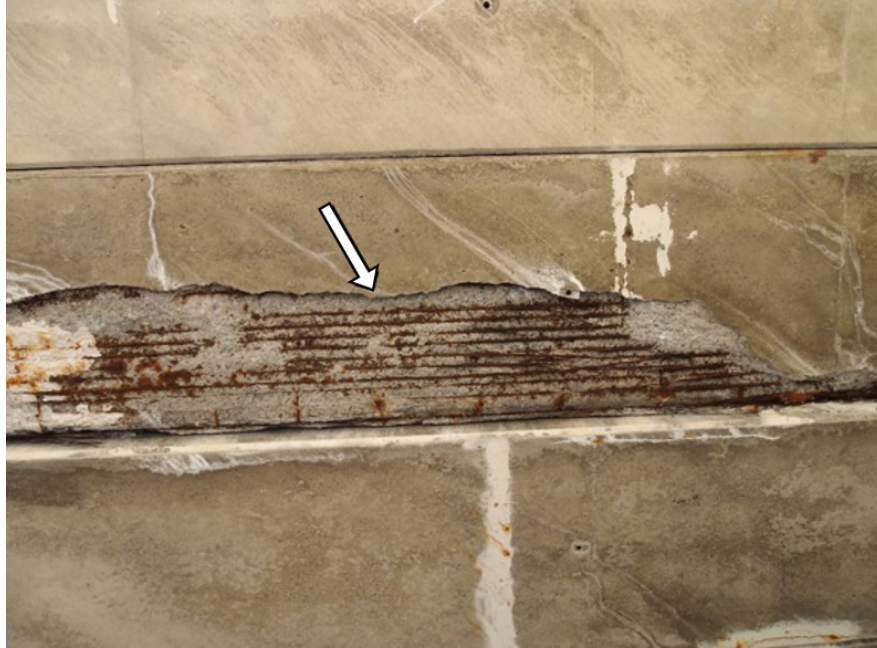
Spall and Exposed Corroded Reinforcement Strands, Mid-Span of Box Beam
